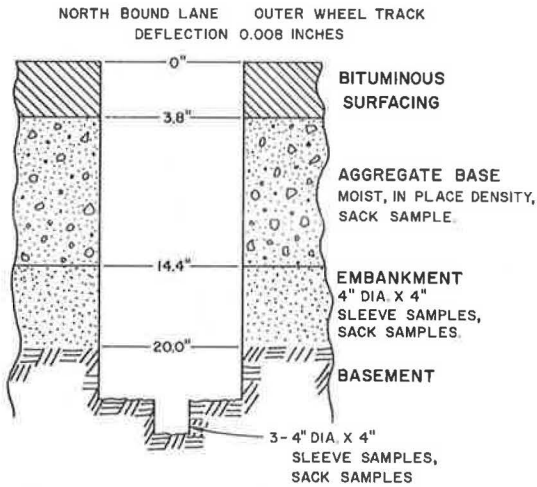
Structural section sampling diagram, Road 04-Mrn-Son-1.
